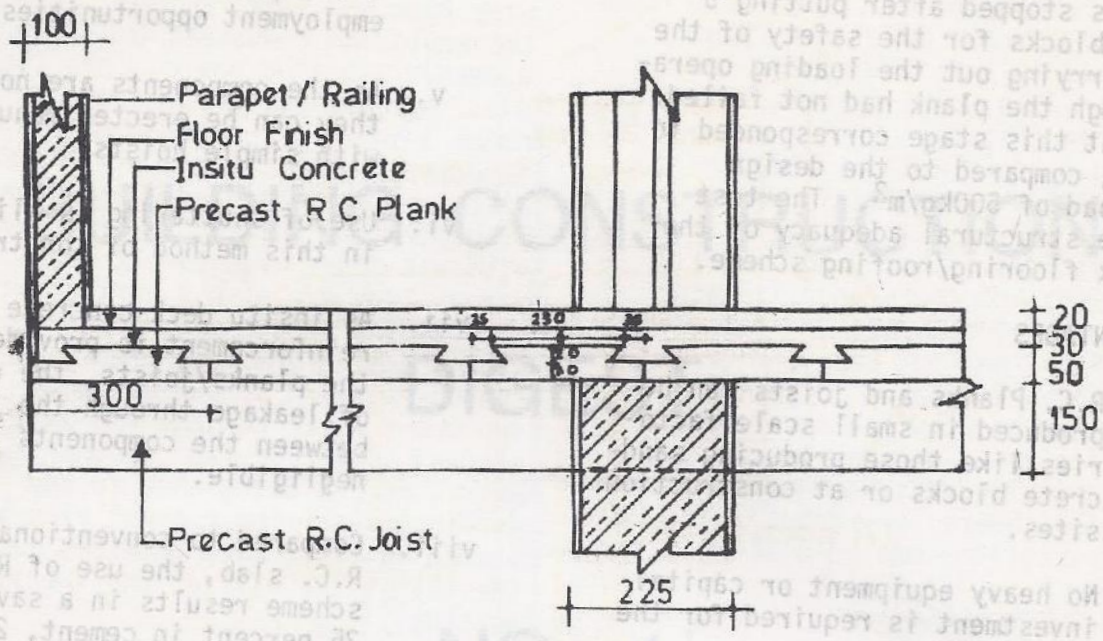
CANTILEVER JOIST AT FLOOR LEVEL
